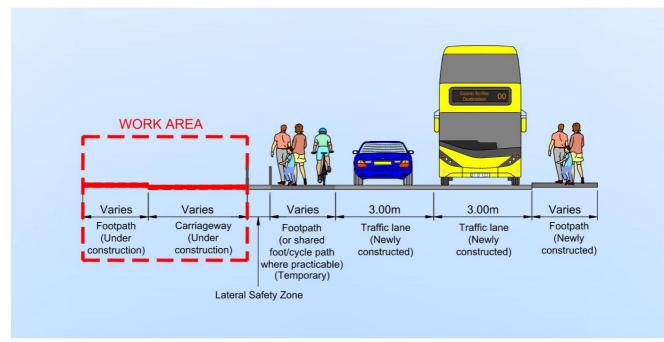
Traffic Management Cross Section, Section 5c - Stage 2
